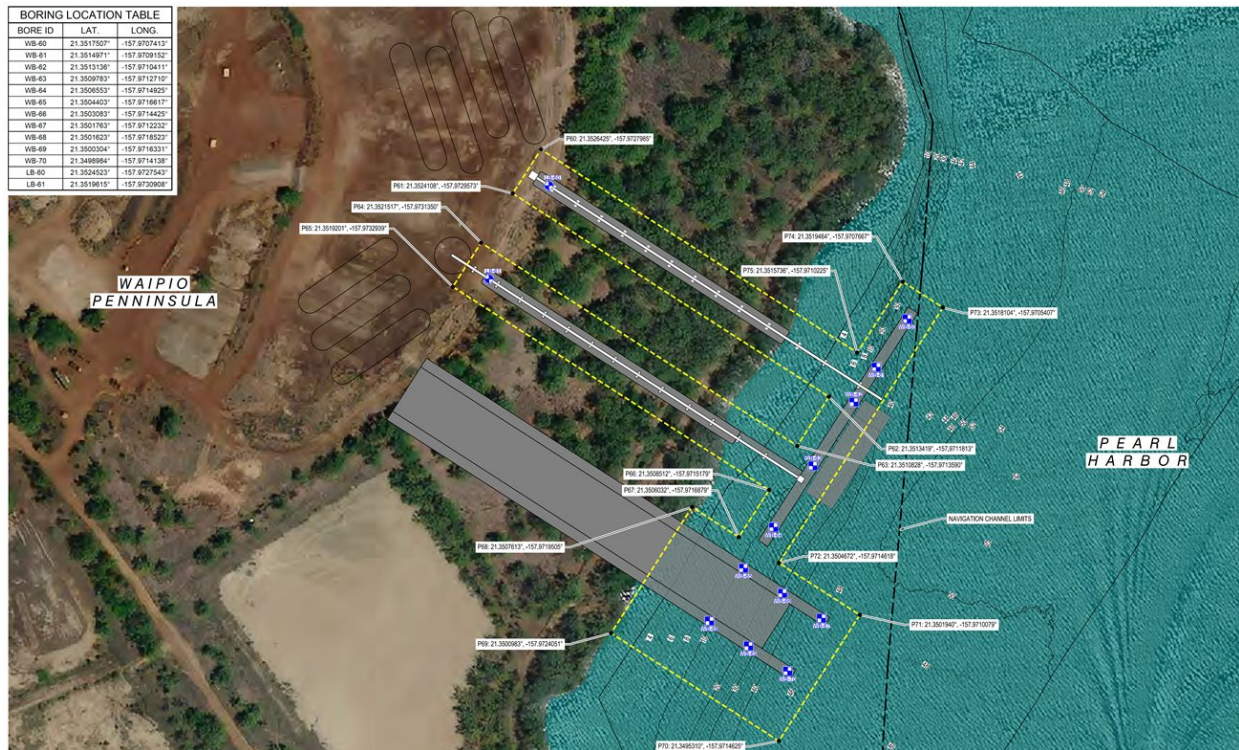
Conceptual design of temporary ramp and offloading pier at WP; the yellow border indicates the limit within which boring samples were collected, and the numbers in blue & white boxes indicate locations of boring samples collected.
